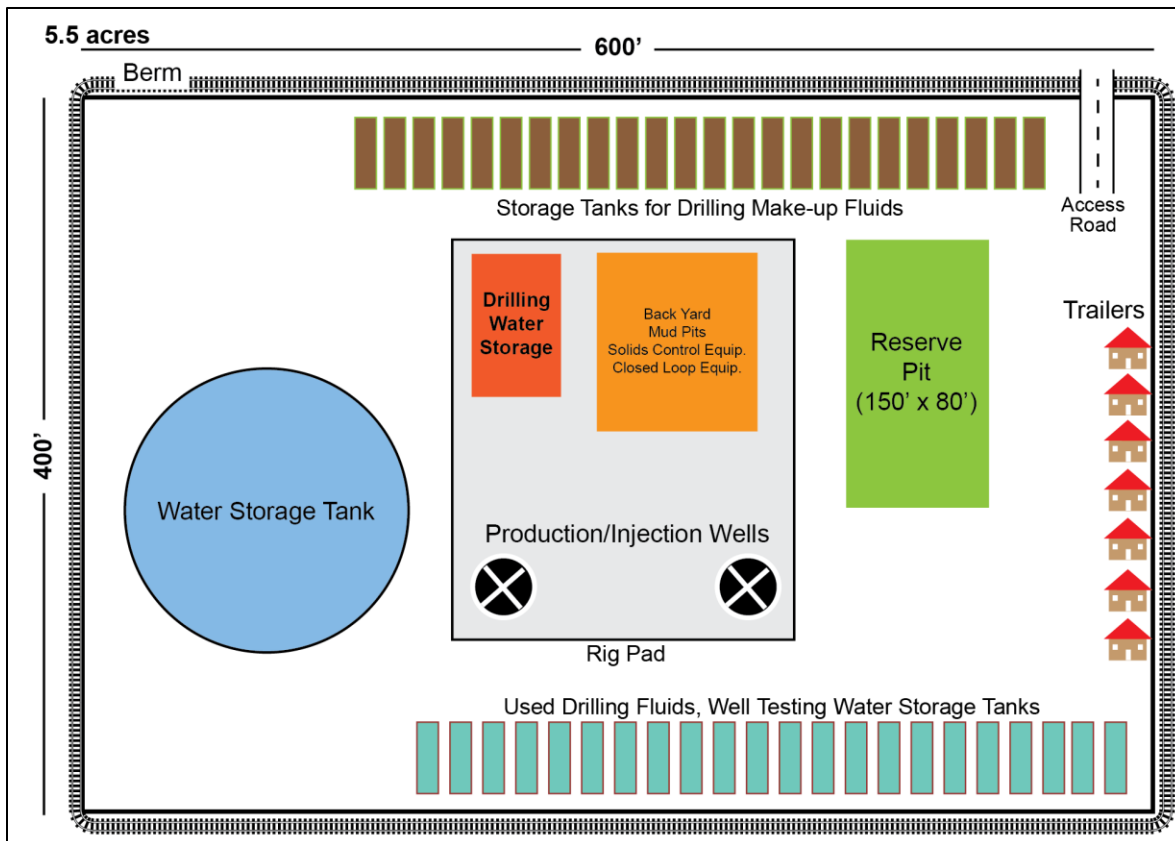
Pad layout for the deep production and injection well at pad A1.
